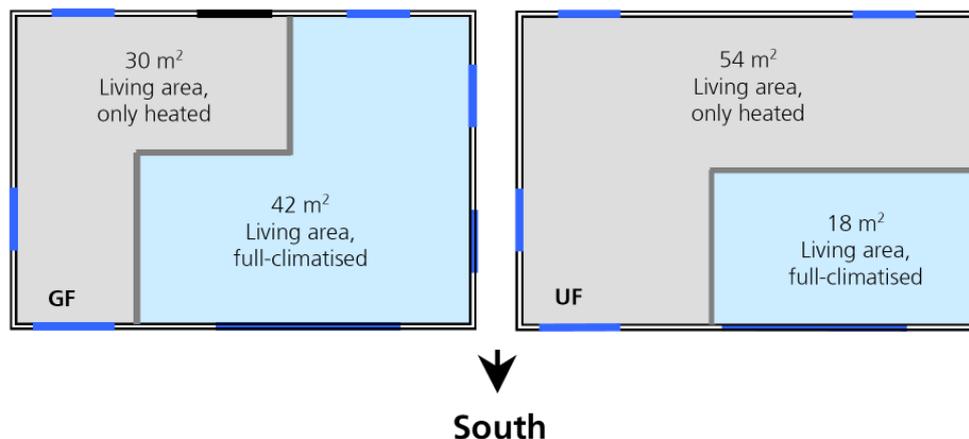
Single-family house. Plan of the ground floor (GF) and the upper floor (UF) with both heated and full-air-conditioned rooms. Not true-to-scale.
